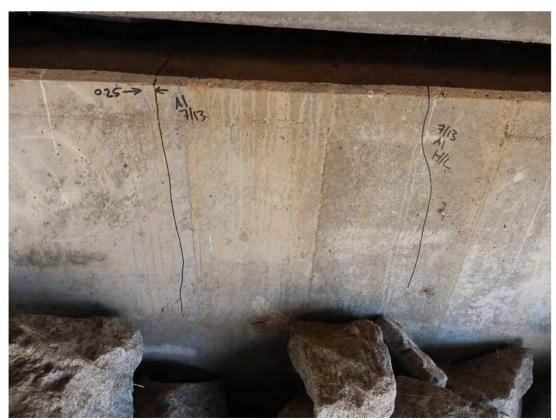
Abutment 1 capbeam between beams 2 and 3. Hairline to 0.25mm vertical cracking. (Taken: 30-Jul-2013)
